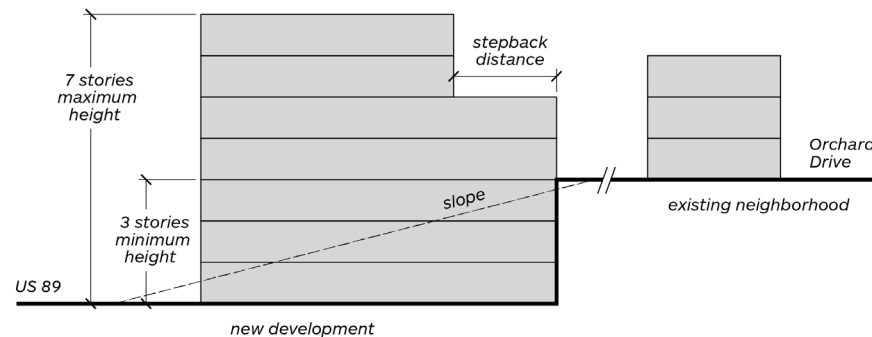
Building section height and stepback on sloped site diagram. Not to scale
